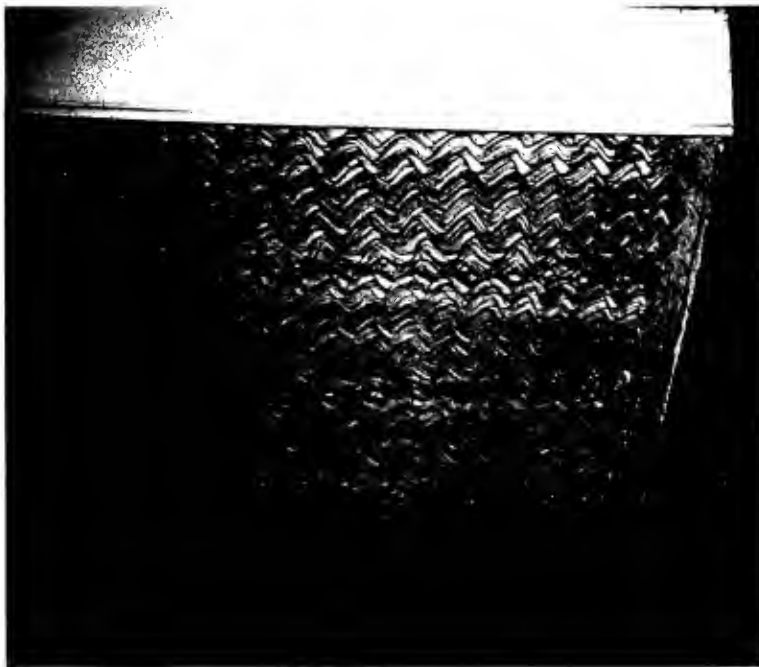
Decorative-painted stairwell with black squiggly lines on plaster. This painting is found throughout the MacFarlan house in almost every room on the second floor and on two fireplace surrounds and window sills in either black or yellow. This occurrence indicates the entire house was remodeled at one time.
